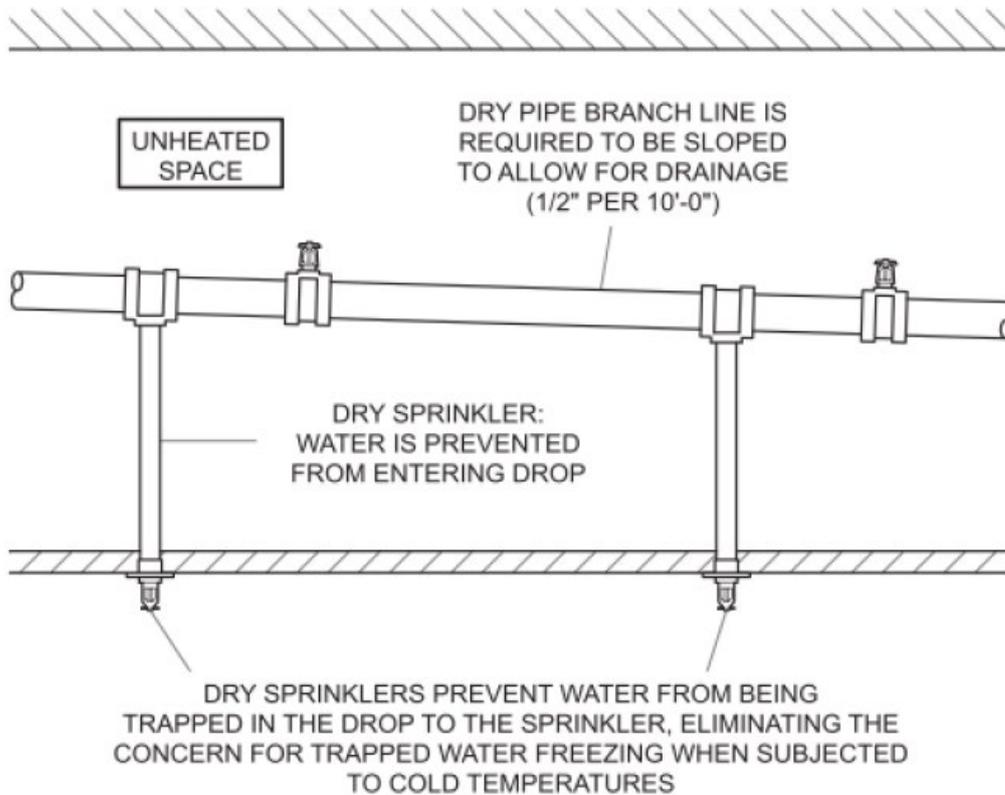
A typical installation of dry pendent sprinklers on a dry-pipe system. The dry sprinklers prevent stagnant water in the drop to the sprinklers, remaining after sprinkler operation or testing [31].
